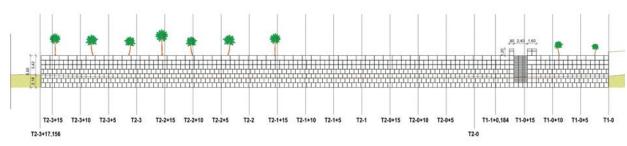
Floor plan - maritime containment executive project in BetonBloc, Ipojuca/PE Source: Authors (2019).
